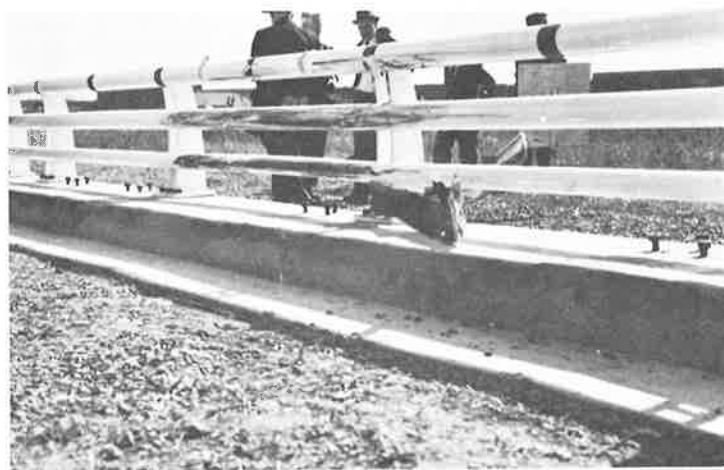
High-strength bridge rail which inflicted severe damage while redirecting impacting vehicle.
